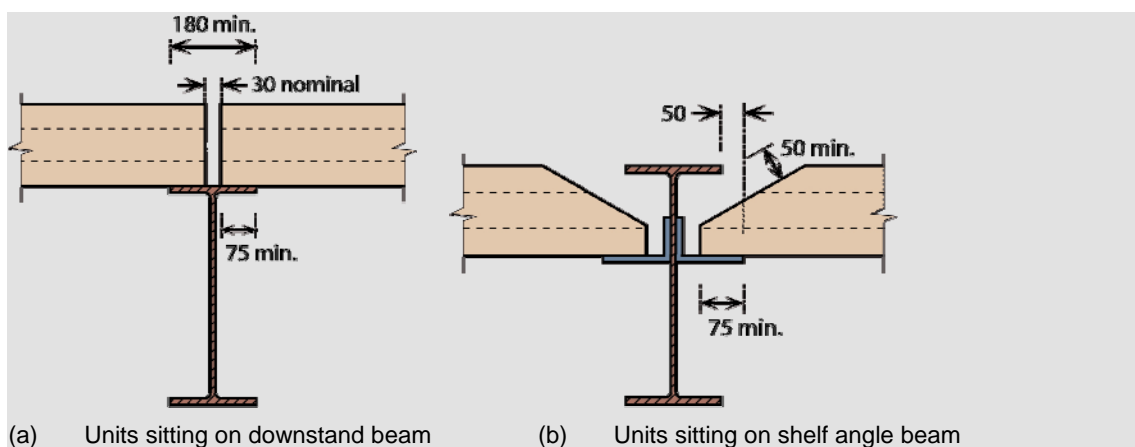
Floor construction with precast concrete units in non-composite construction
